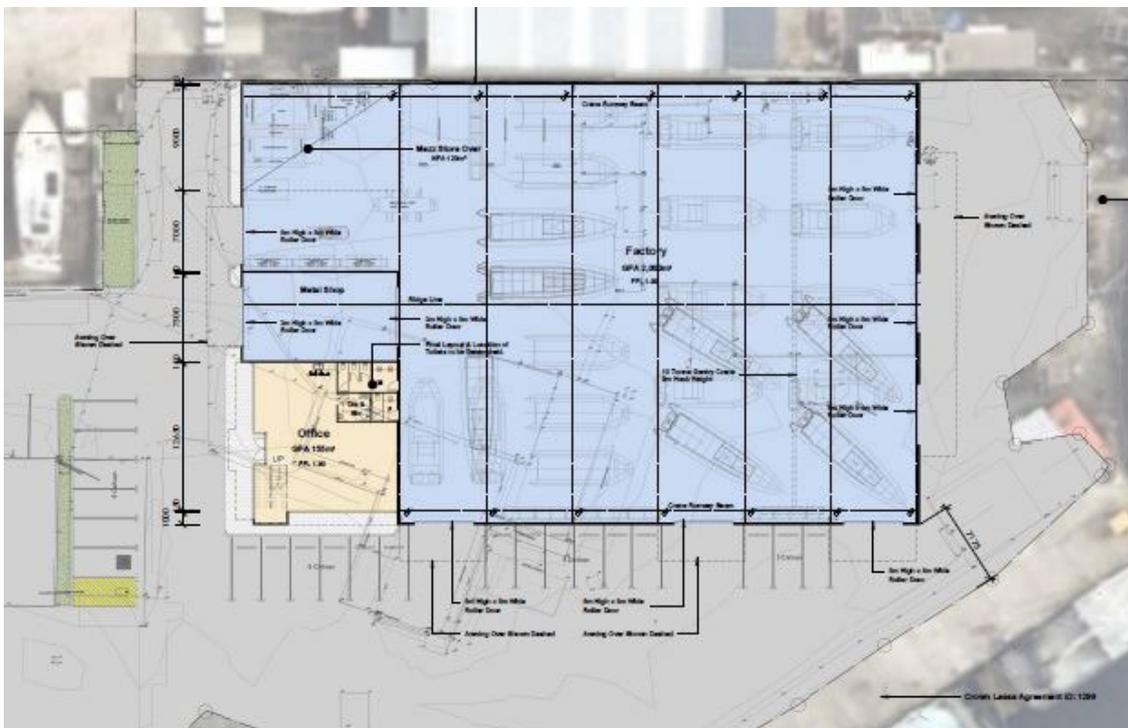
Site plan of proposed use and development (Source: Meyer Shircore Architects)
